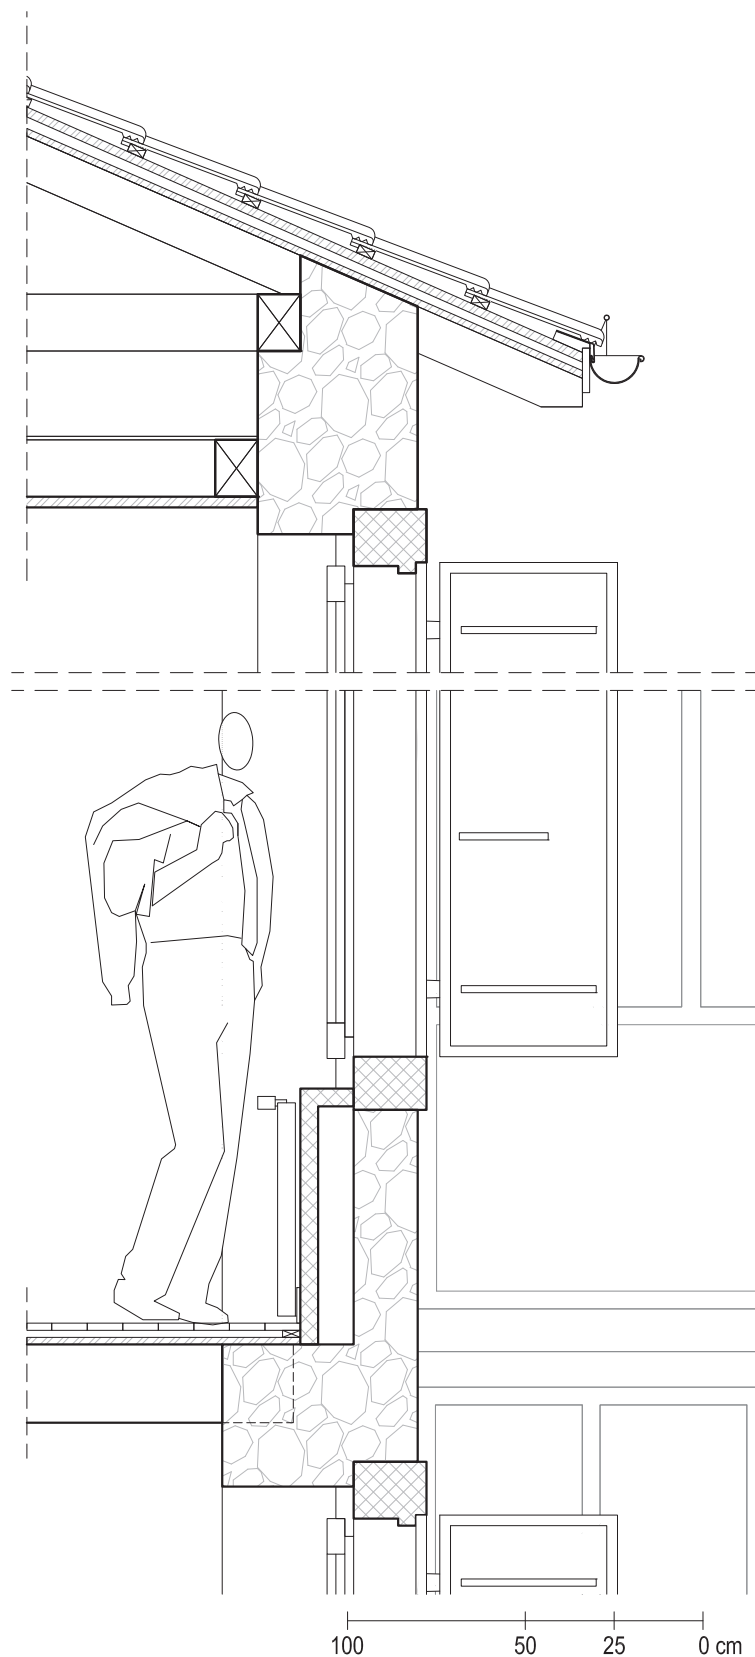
Façade and roof constructive detail, E0 – Current Status, Archetype 1.
